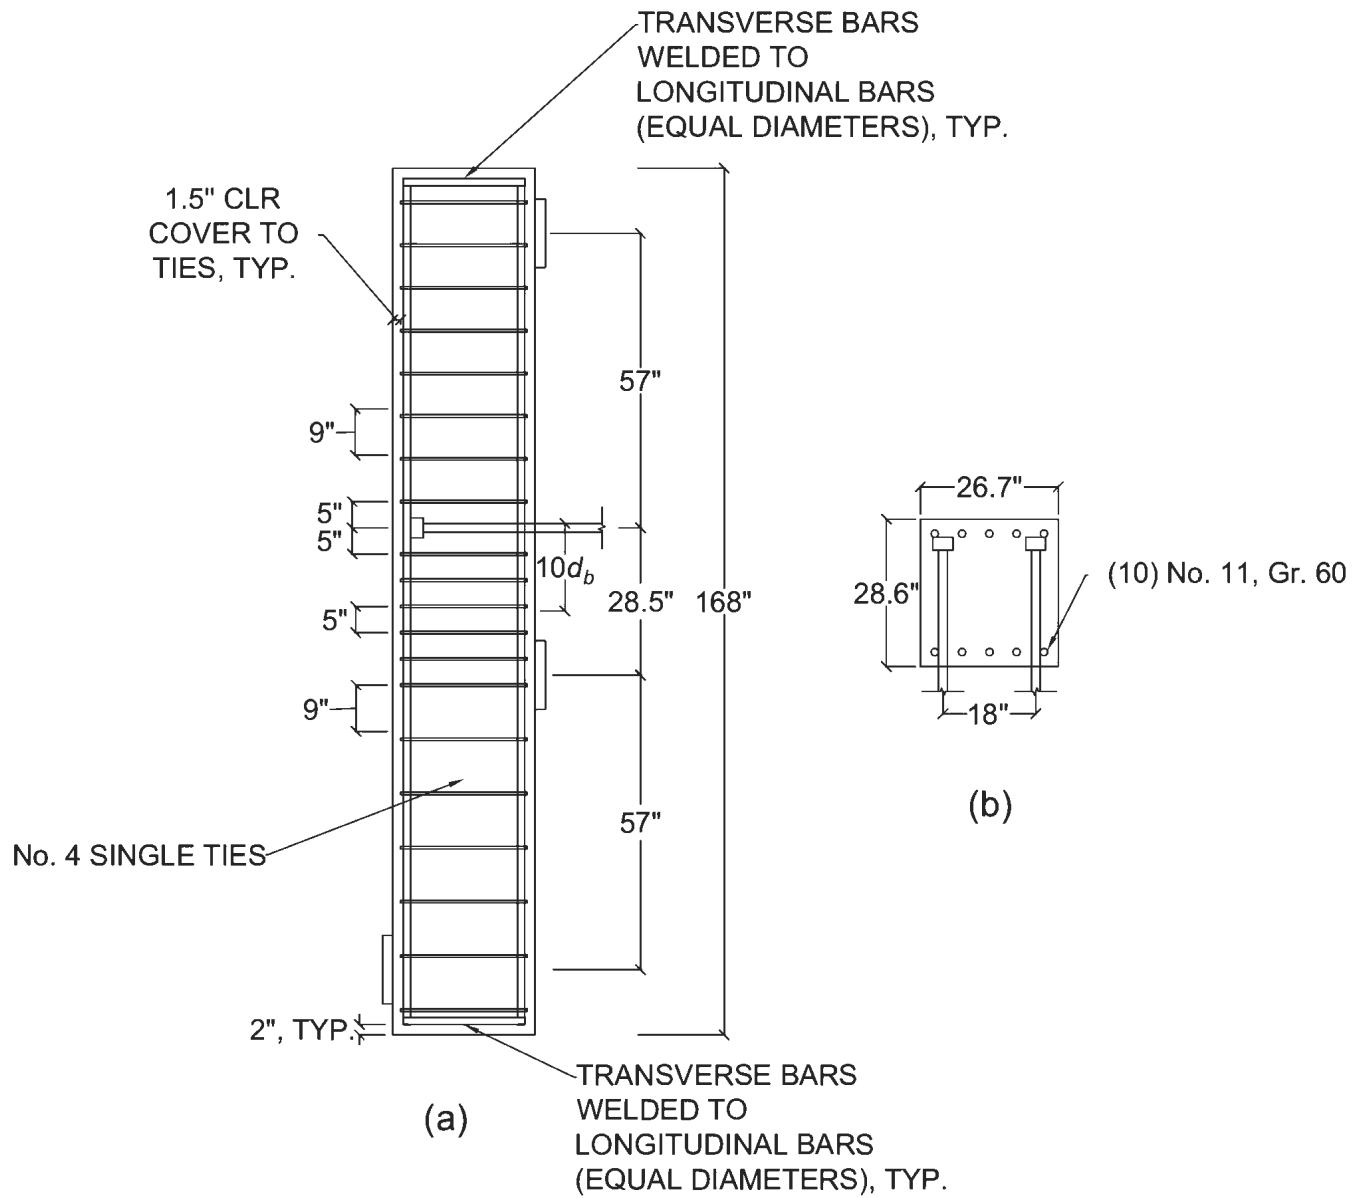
Details of reinforcement layout for No. 14 headed bar specimen 14-2A: (a) elevation, (b) cross-section
